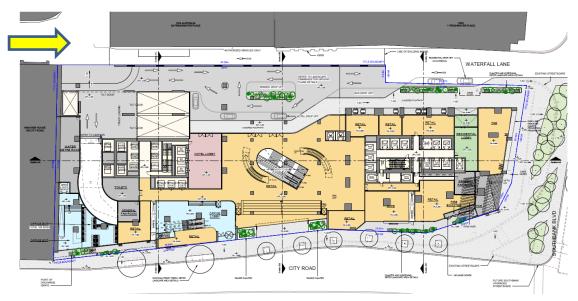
A - Ground floor plan of approved development at 102 - 158 City Road showing upgraded Waterfall Lane (source: application documents prepared by SJB Planning)
